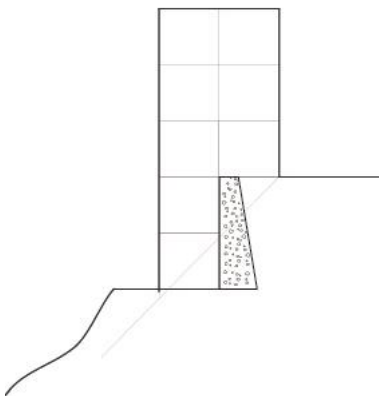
Retaining wall part of structure (Shock Safe Nepal group 1).
